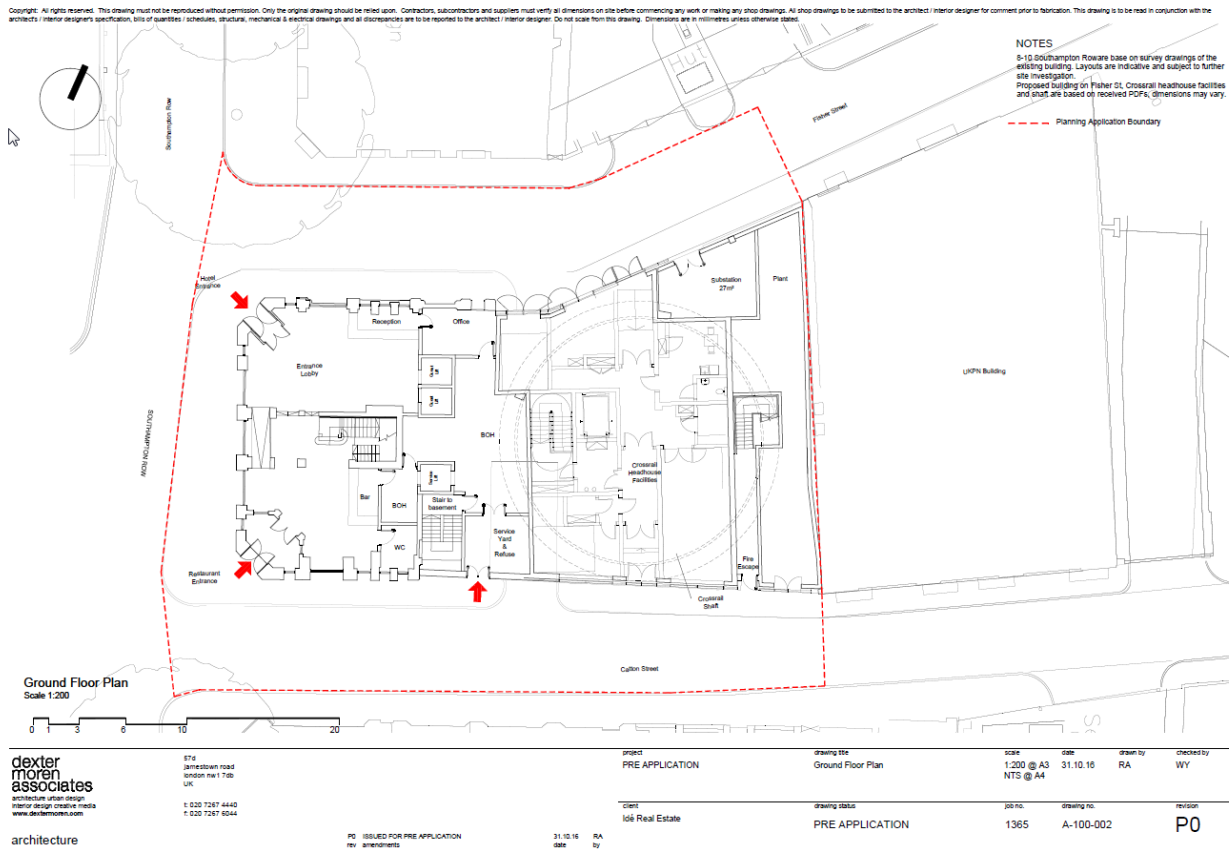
Ground Floor Level Development Plan (Source: Dexter Moren Associates)
